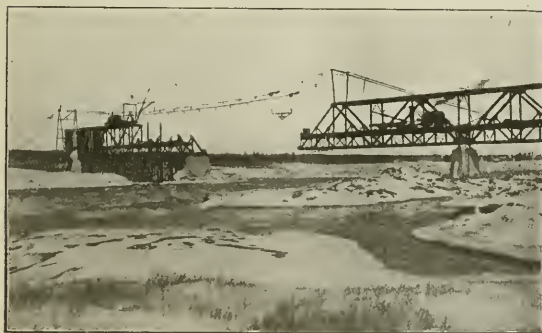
View Showing Cableway With Its Equalizing Girder; Derrick-car on Southern Cantilever; Traveller on Top-chords of Northern Anchor-span
